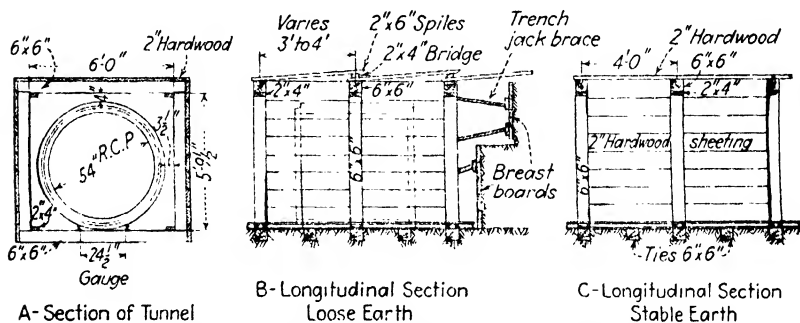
Driving and timbering details, Liberty St. storm sewer tunnel, Erie, Pa.
